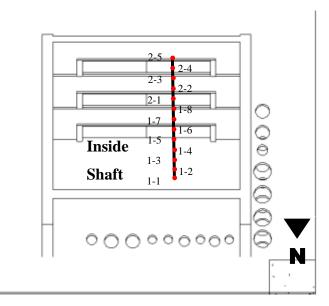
TC inside elevator shaft from 5th to 3rd floor
